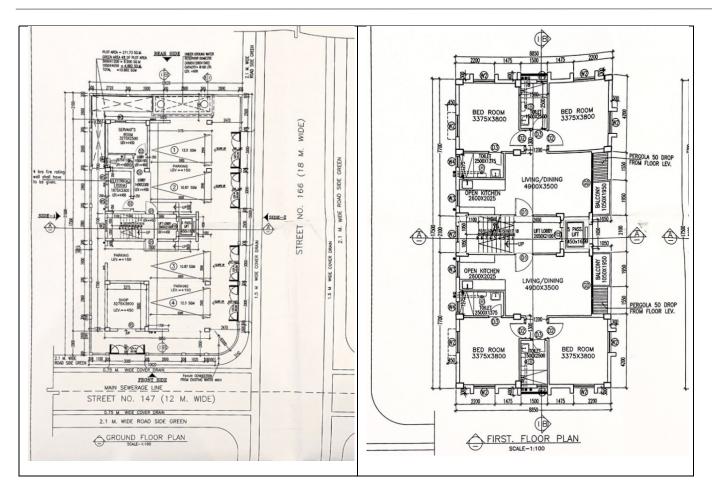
Ground Floor Plan & Typical Plan for 1st, 2nd and 3rd Floors
